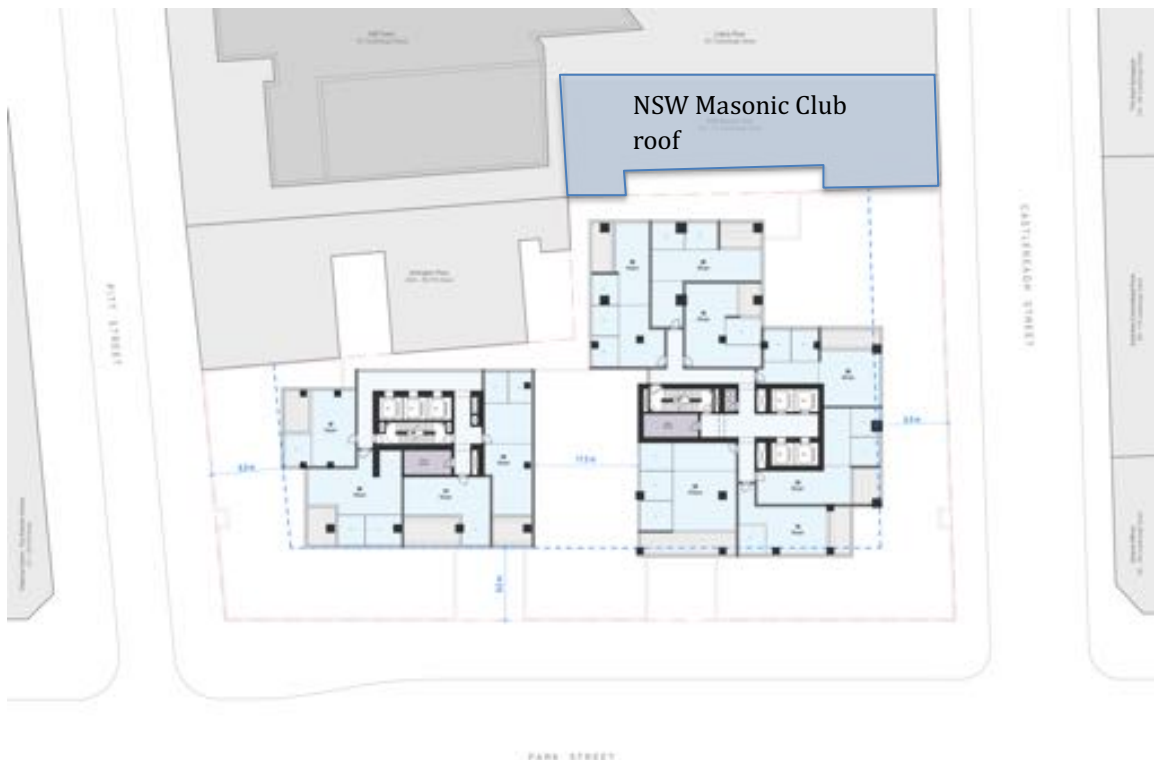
Indicative Scheme Drawings – Tower Level 13-19 plan- Pitt St. North OSD. NSW Masonic Club indicated with blue outline. Pitt Street North OSD Concept Application. Appendix F-Built Form and Urban Design Report. Architectus. 2018.
